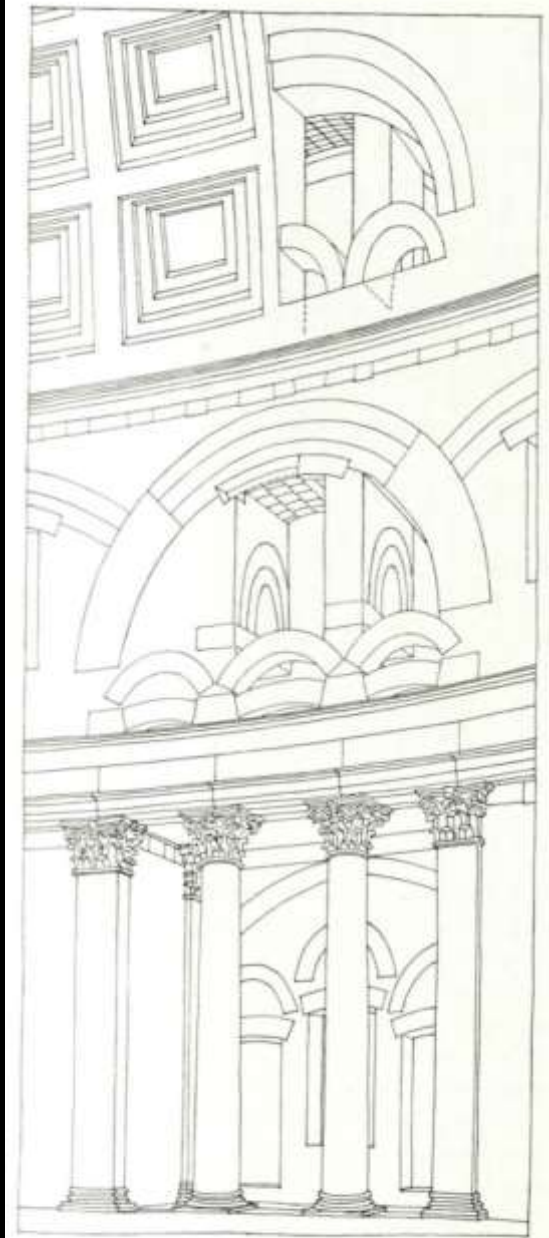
Pantheon: Drawing of the structural principle in a division of the wall of the rotunda.
